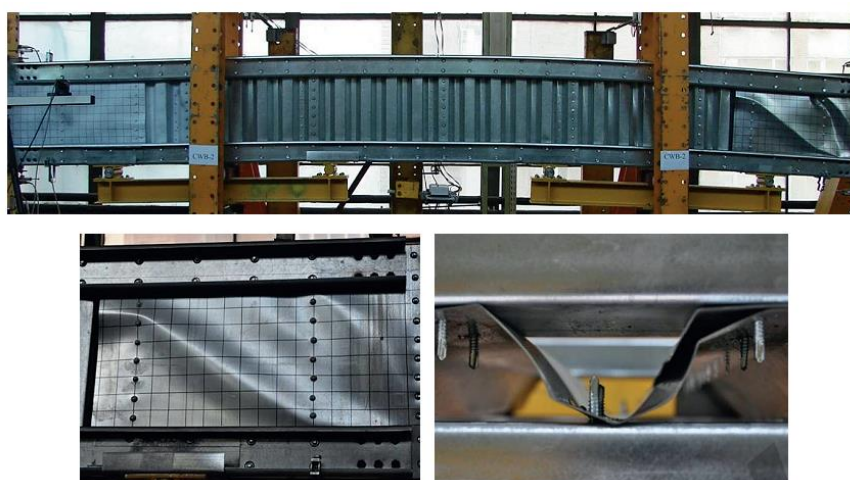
Built-up corrugated web beam with self-drilling screw fastener
